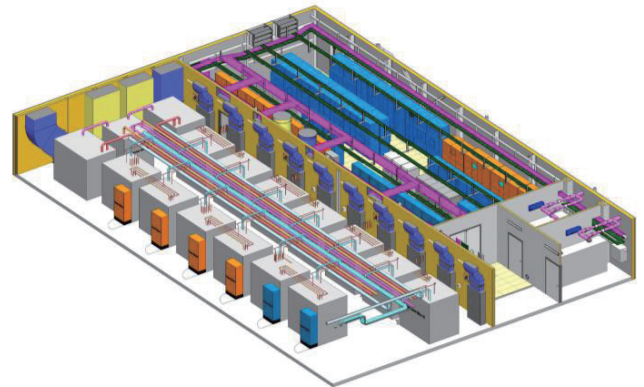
Future CMS machine room for the primary cooling final systems composed of thirteen compressor modules.
